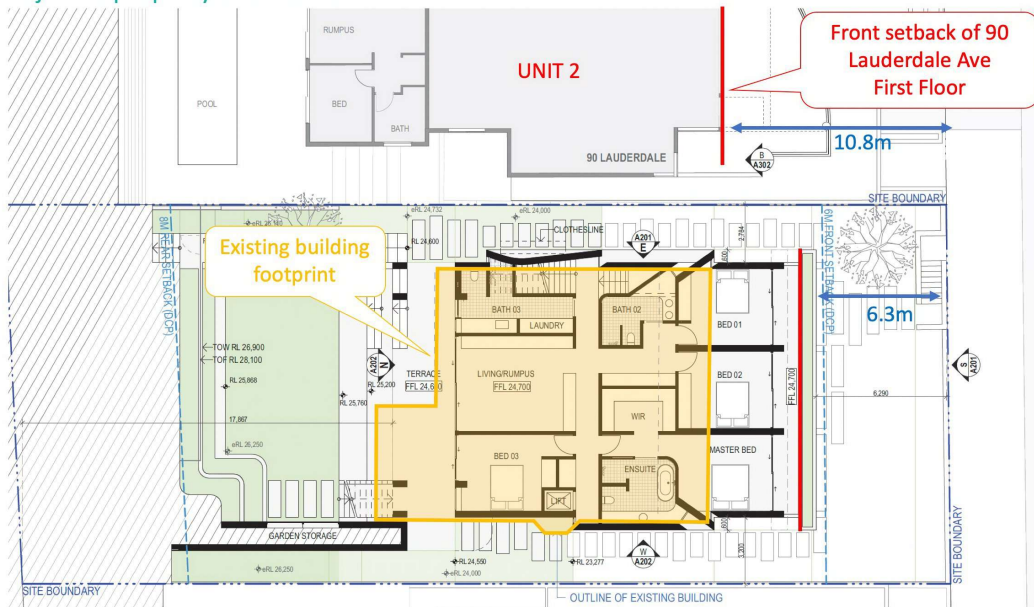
Extract of the Ground Floor Plan (Drawing DA-103 by Archer Office), showing the existing building footprint, proposed front building setback and the established building line of the adjacent property to the east
